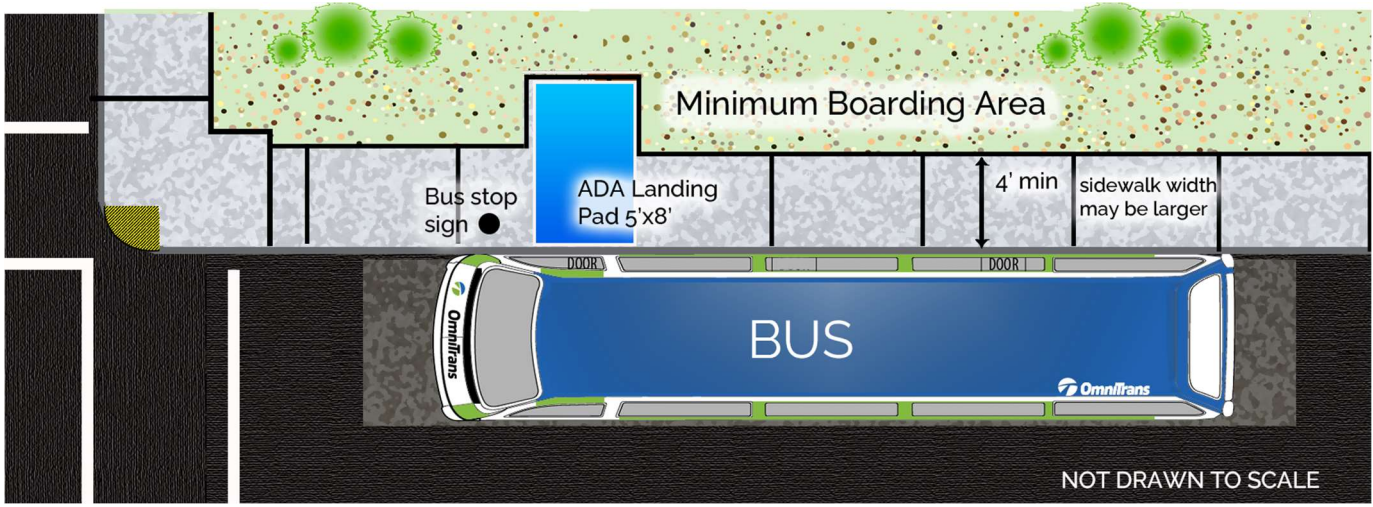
Minimum stop dimensions when sidewalk is adjacent to curb.
